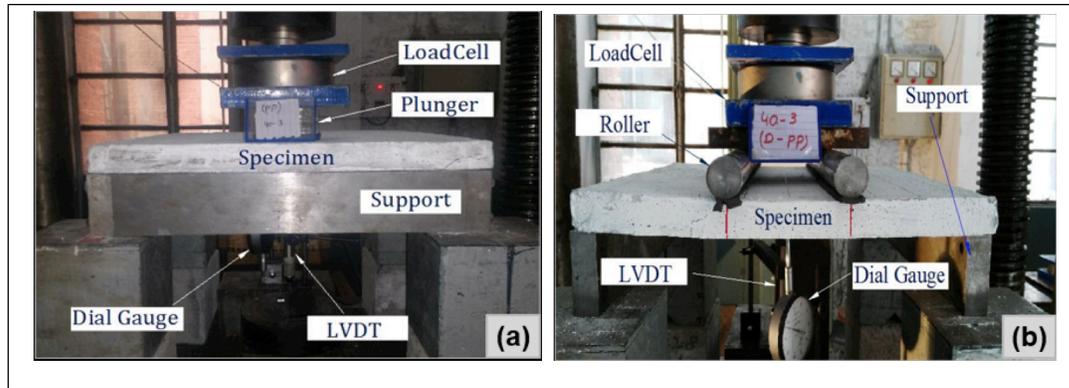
Experimental test setup; (a) Punching shear test (b) Bending shear test
